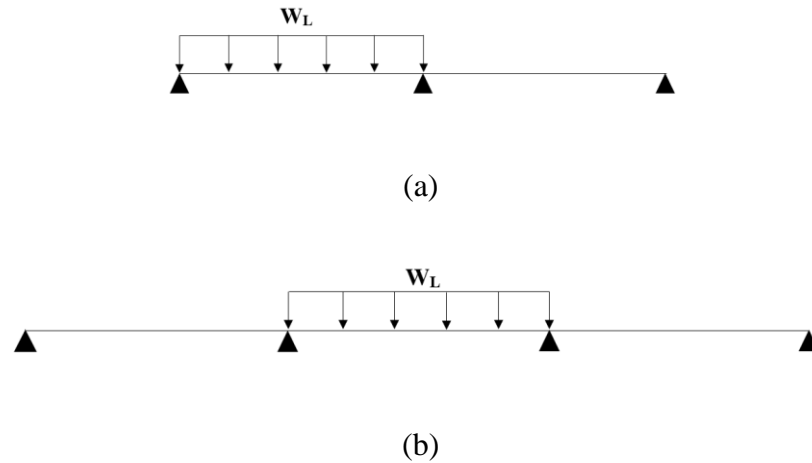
Live load application in continuous beams: (a) Two-span beam (b) Three-span beam
